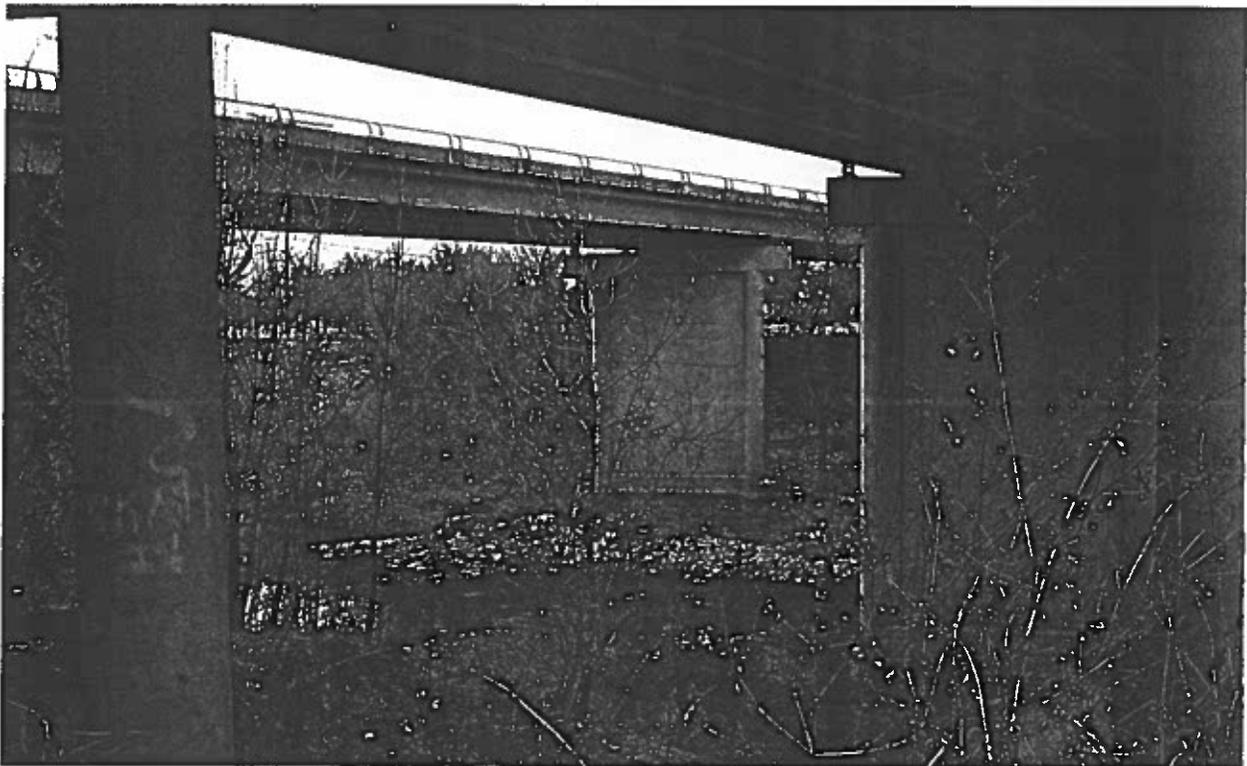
Looking west of north across Trinity River channel scour evident on north bank around support of western bridge. Cut ditch visible in north bank, to the west of the bridge.
